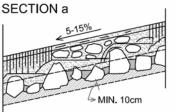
Culvert bottom protective revetment for falls of 5-15%
